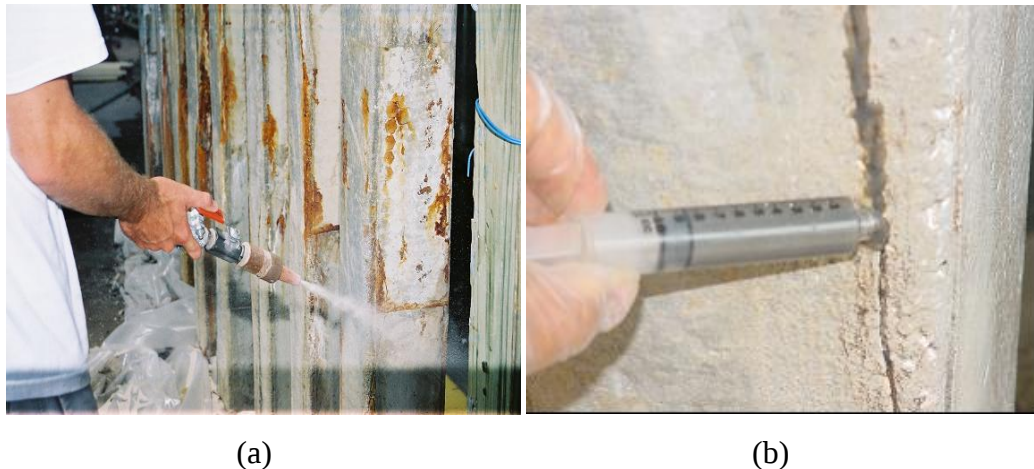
(a) Sand Blasting on the Surface; (b) Crack Sealing Using Epoxy
